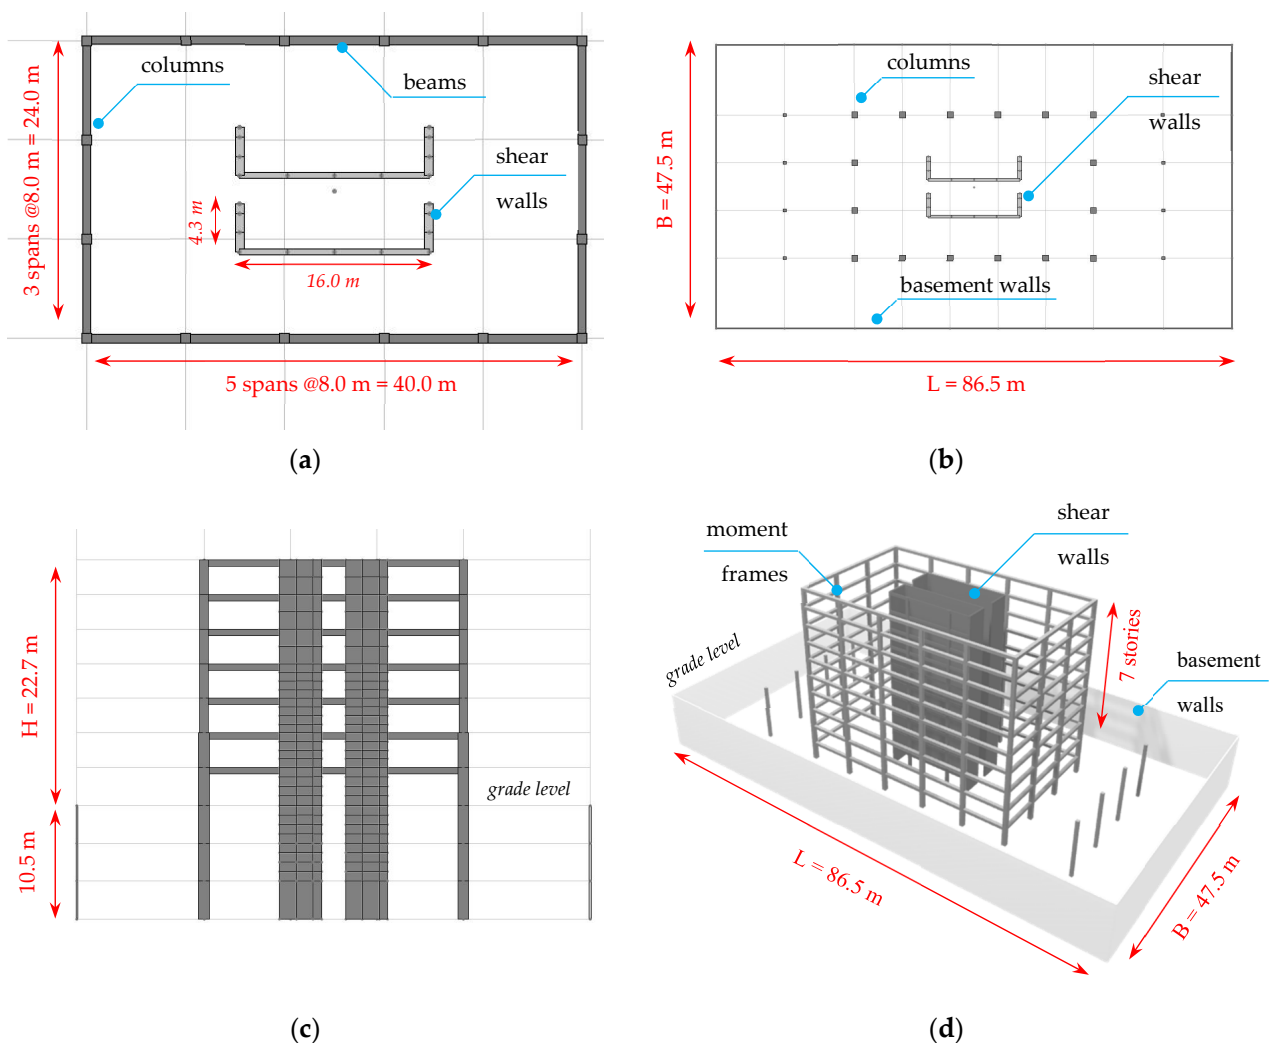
Archetype buildings. (a) Typical floor plan view. (b) Underground floor plan view. (c) Lateral transverse view. (d) 3D view.
